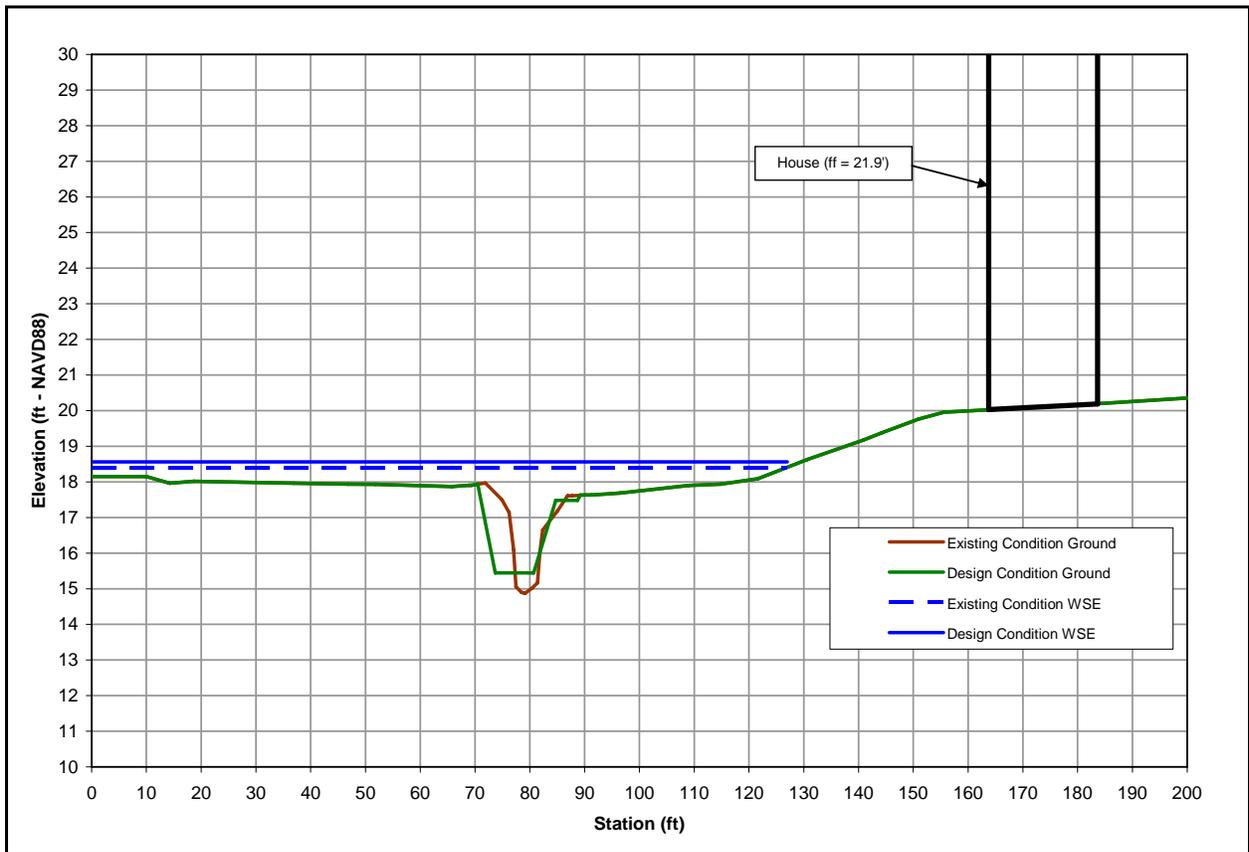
Cross-section 5783 showing existing and design condition water surface elevations (WSE) at 5-yr flood ($Q_5 = 201$ cfs). See Figure 10 for cross section locations.
